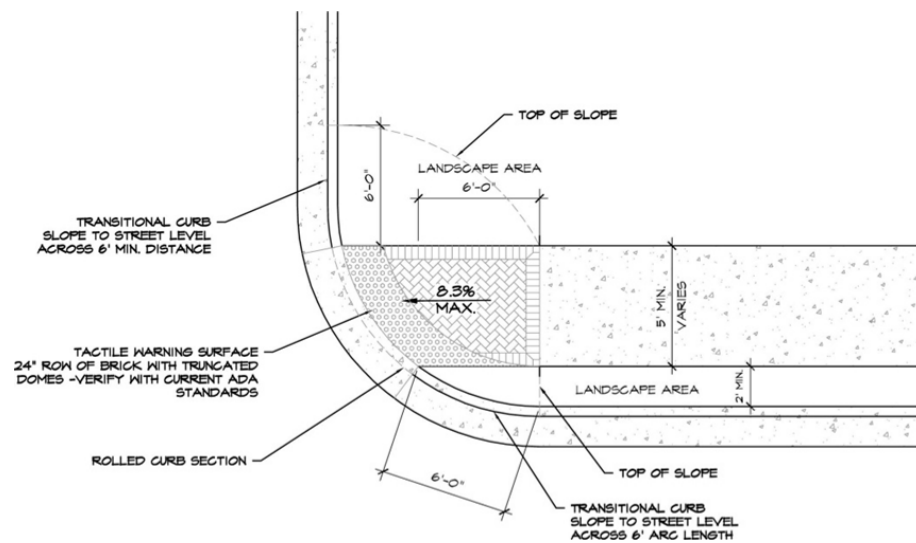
Typical Ramp Design Alternative w/out Turned Back Curbs
